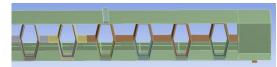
Beam model with Hexagonal folded web plate of one central stiffener
